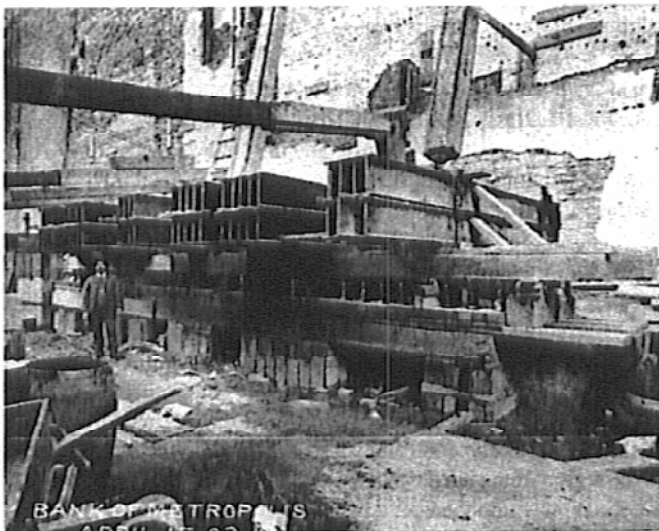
Underpinning the Metropolis Bank Building, San Francisco, 1902.
